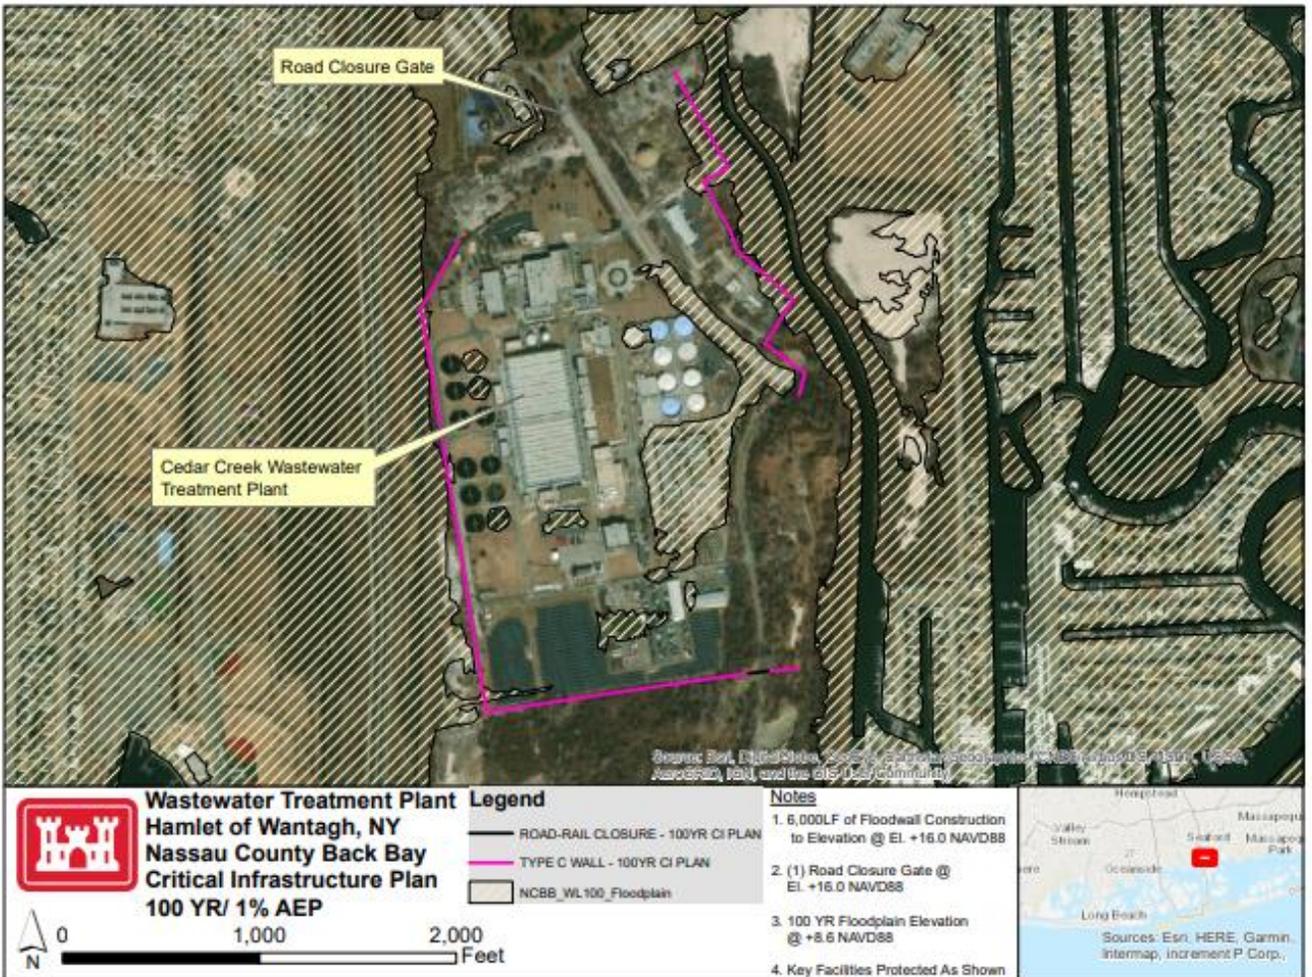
Local Floodwall in the Hamlet of Wantagh
